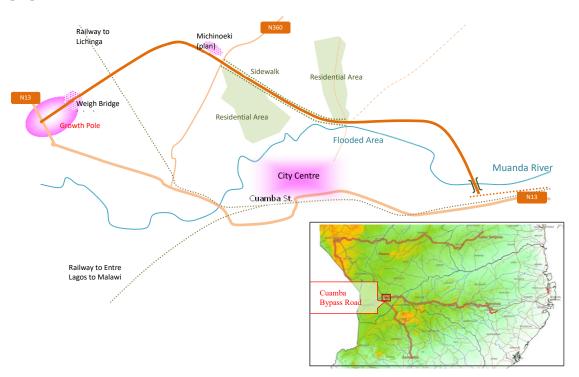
Road Development Plan for Cuamba Bypass Road
